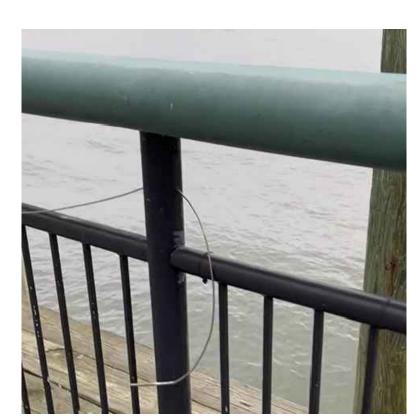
WEST PERIMETER HANDRAILS LOSE AND LOST TENSION CABLE
